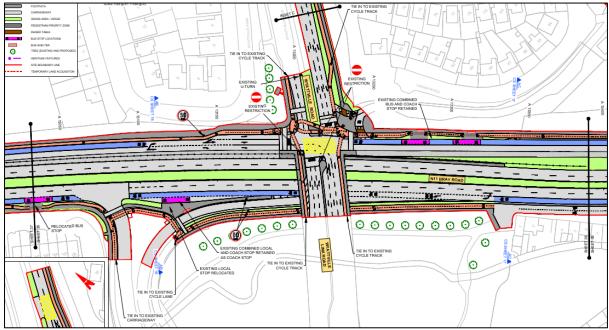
Extract from General Arrangement Drawings (Sheet 38)
